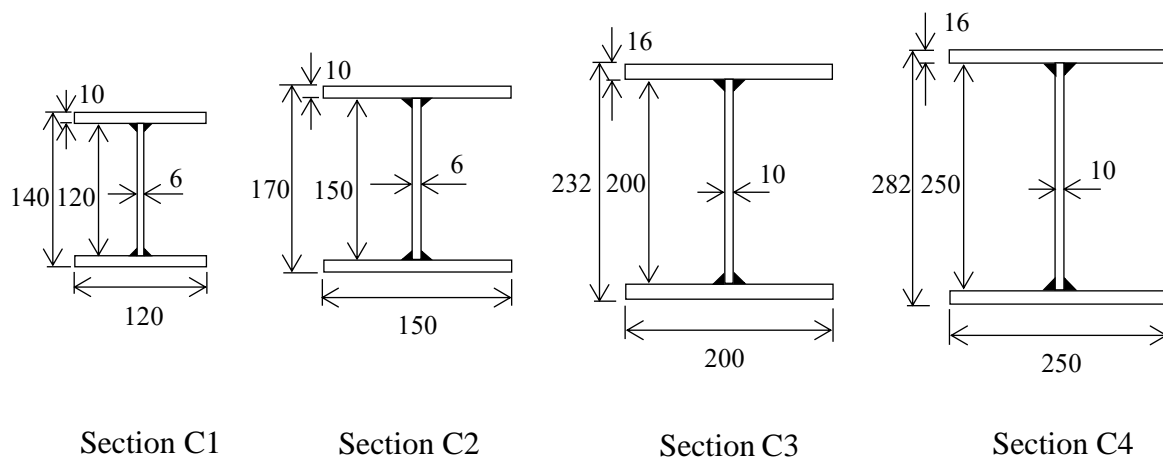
Nominal cross sectional dimensions of high strength S690 steel welded H-sections
